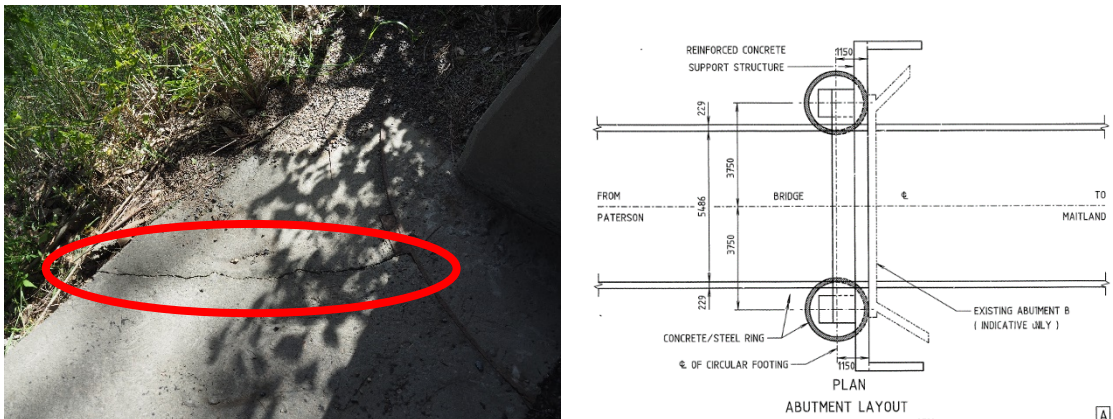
Cracking of abutment inspection platform (Source: FBE)
